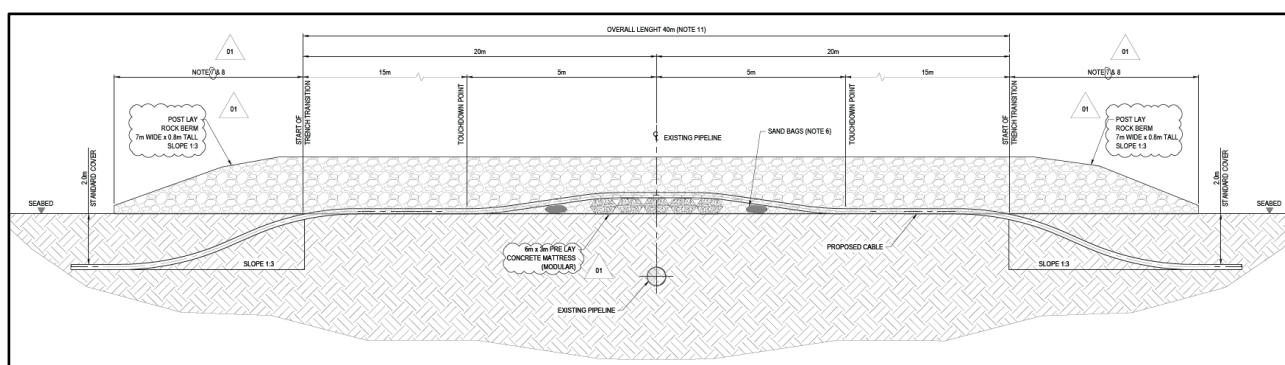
Cross Section Of Typical Arrangement For Crossing Of Existing Buried Pipeline
